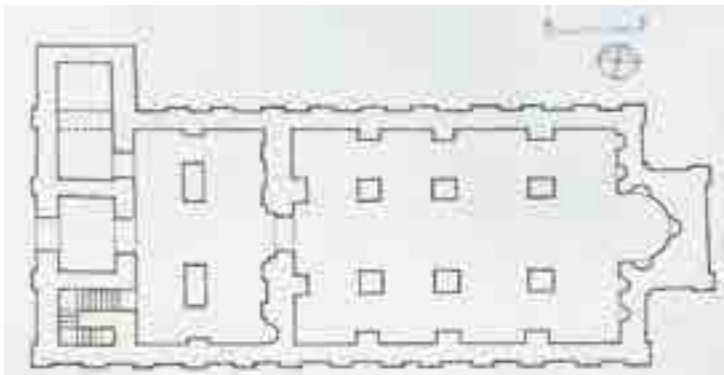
Otok (Solin), Sv. Stjepan plan, d'après M. Jurković
